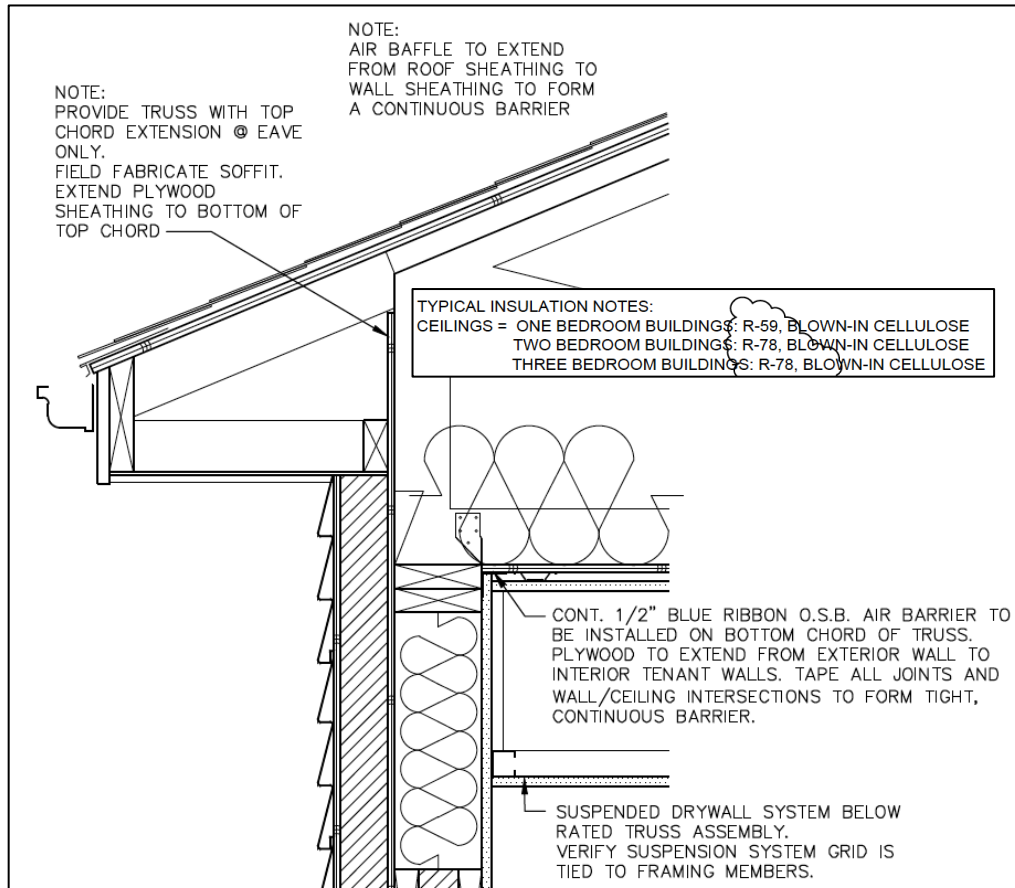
Ceiling detail and insulation levels [Drawings by SWBR]
